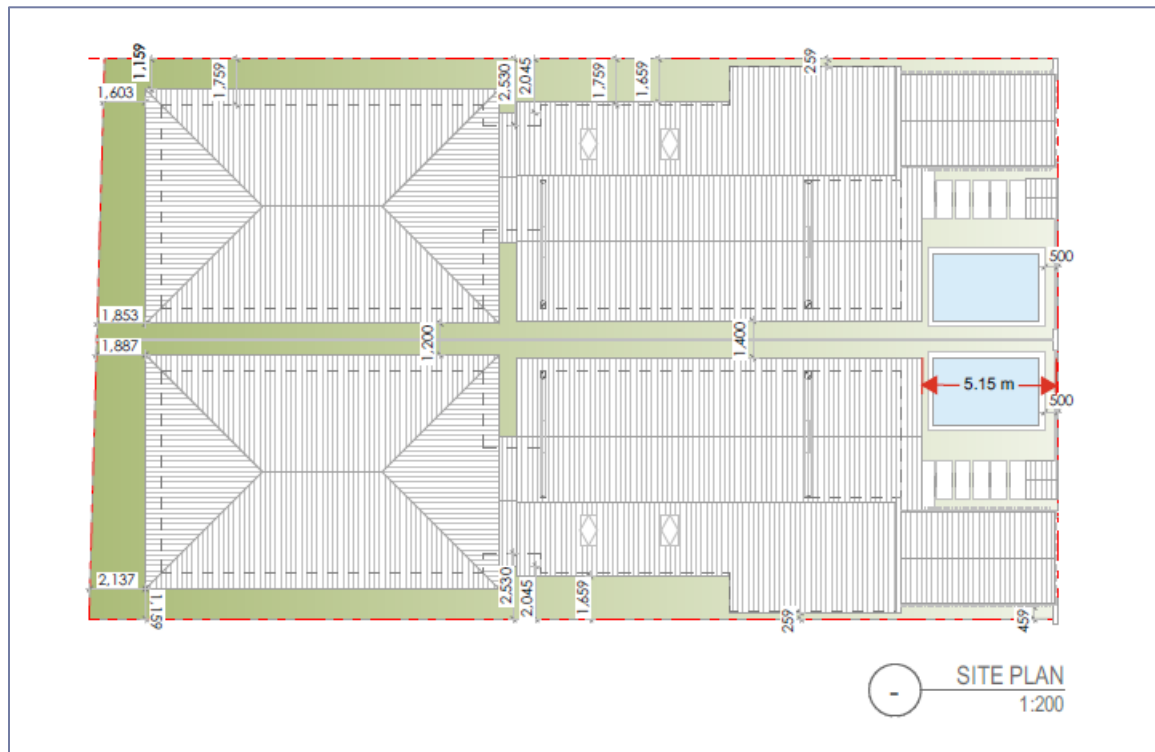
Proposed Setbacks (Proposal Plan Extract – Additional measurement added by Aspire).
